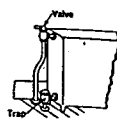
TOP AND BOTTOM RADIATOR CONNECTIONS
